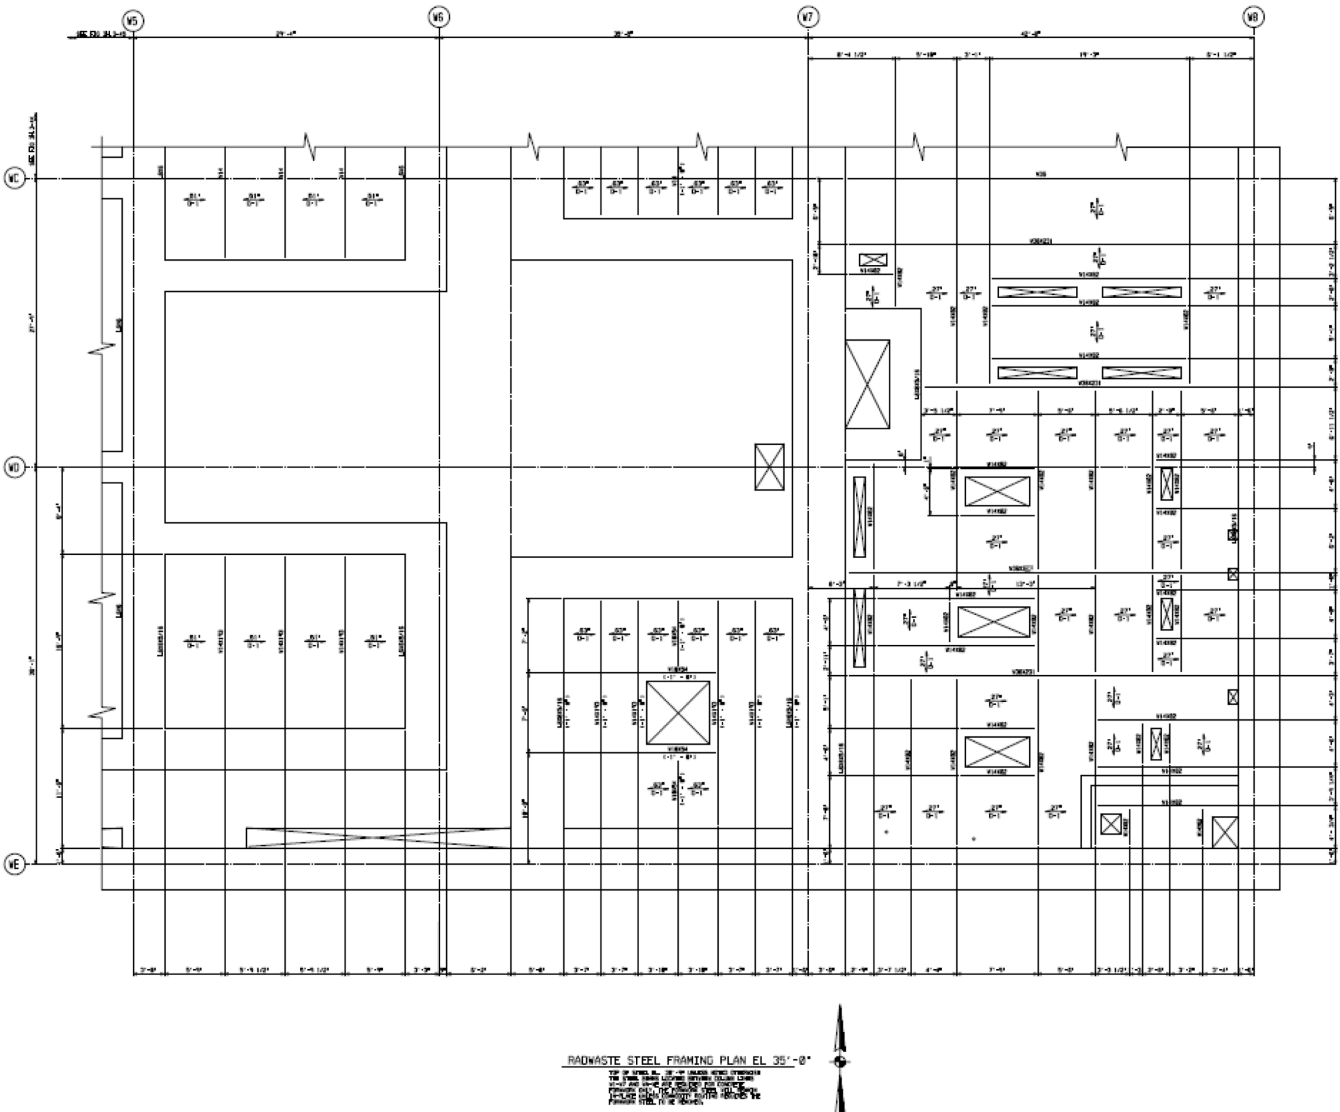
H.3-46 RWB EI 35'-0" Steel Layout Between Column Lines W5-W8 and WC-WE
